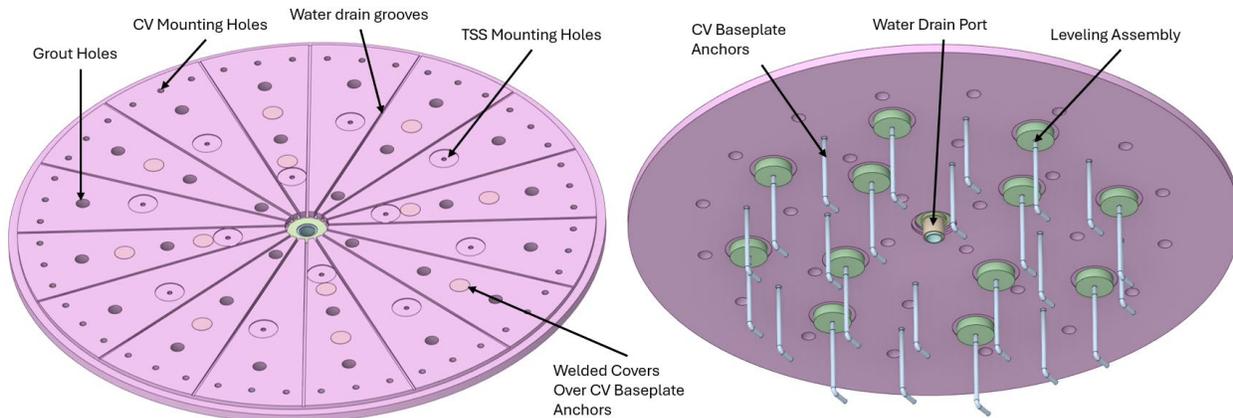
CAD images of the top and bottom of the Core Vessel Baseplate
